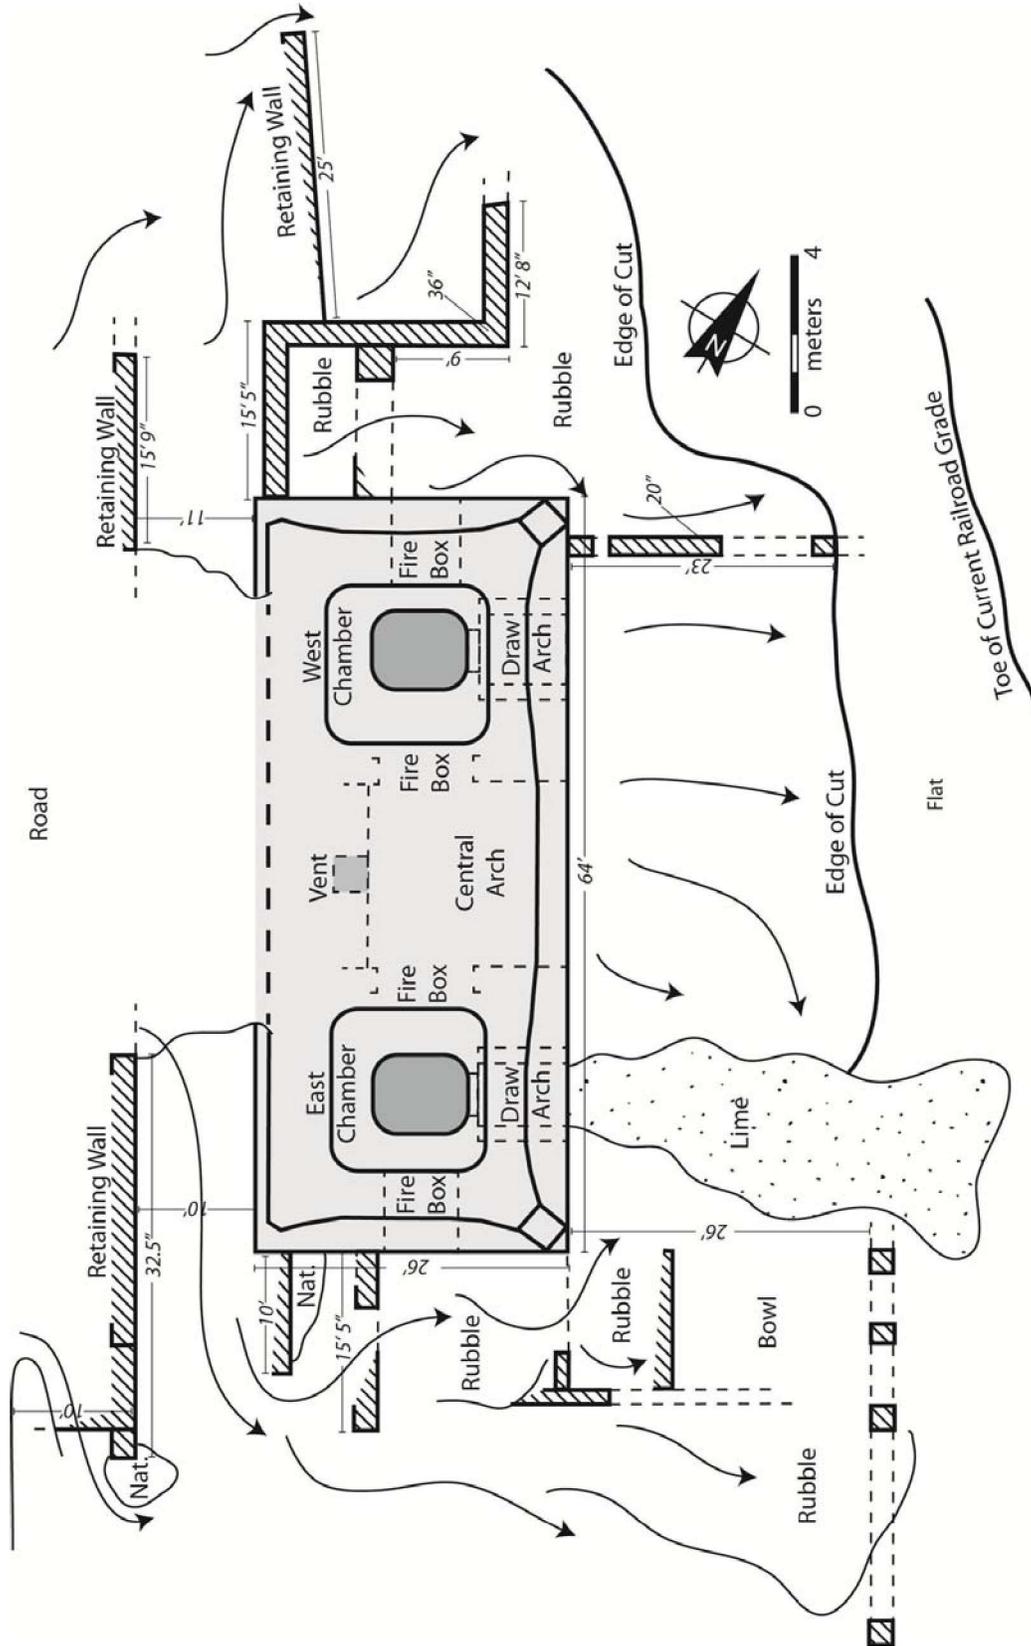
PLAN OF 1882 KILN AND SURROUNDING FOUNDATIONS AND RETAINING WALLS
